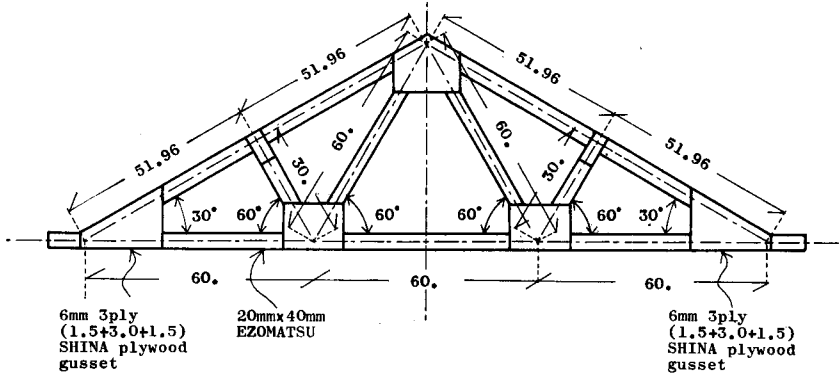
Small scale wooden fink truss joined with glued plywood gussets (Trusses 3 to 12). (unit: cm)
